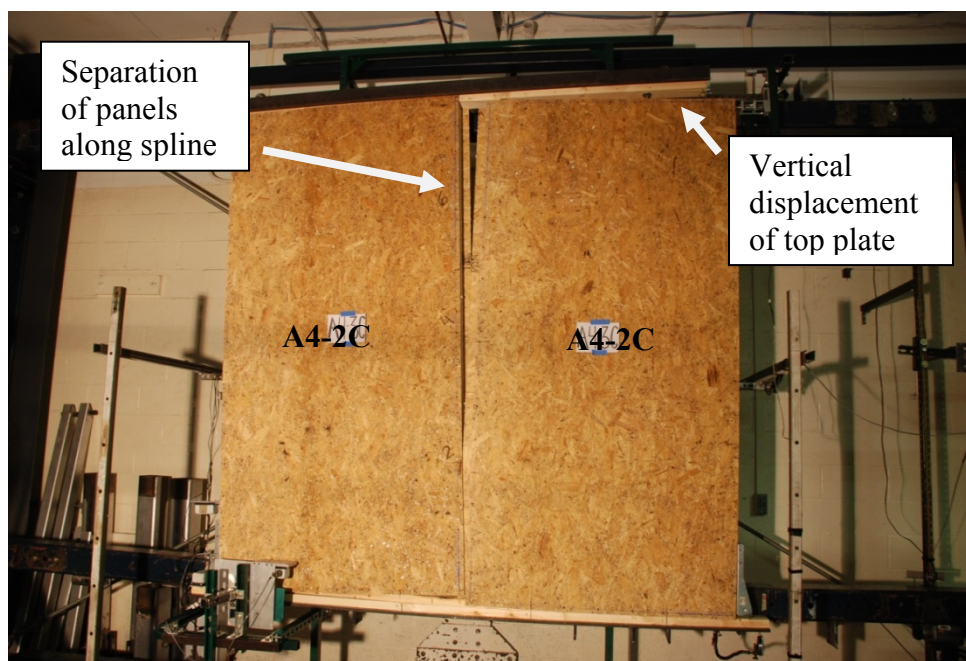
Failure of Specimen A4-2C after cyclic loading
